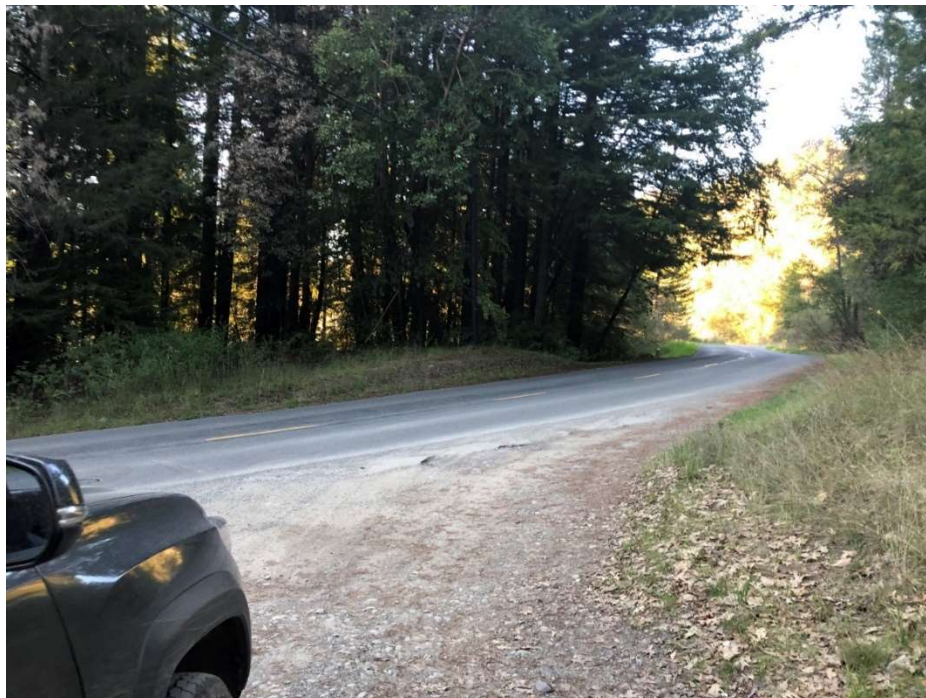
RP 1. intersection of County maintained Sprowl Creek Road and unnamed access road. Vehicle traveling north. Photo taken facing west. (40.089888°, -123.794543°)
